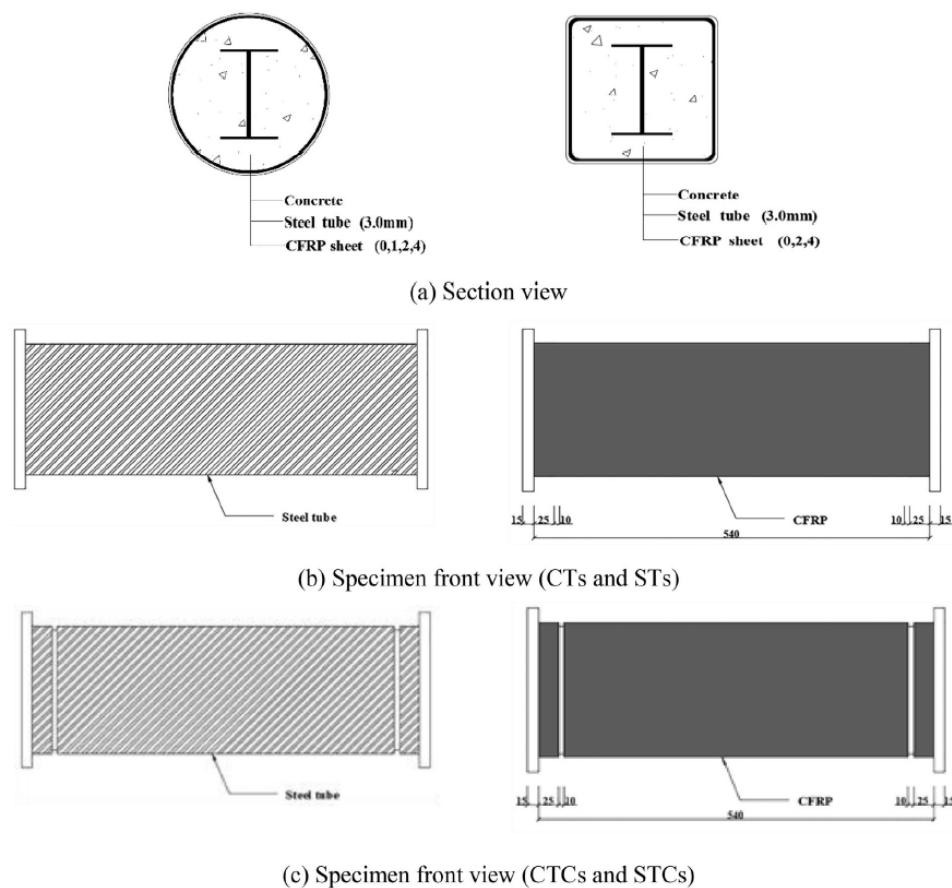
Tested Column Arrangements, T. Kibryia [2017]
